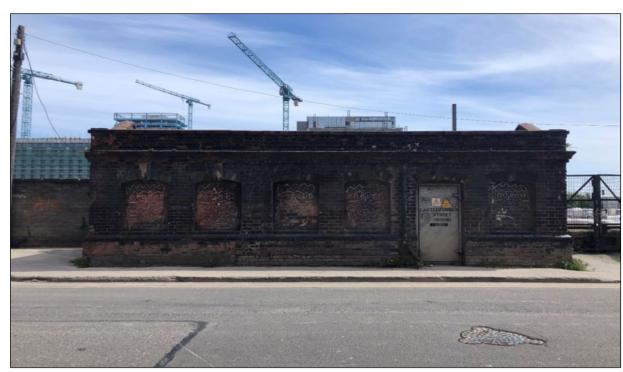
Detached single storey electricity substations external to the site on Castleforbes Road. Source: TPA, May 2020. Collated by TPA, January 2021.
